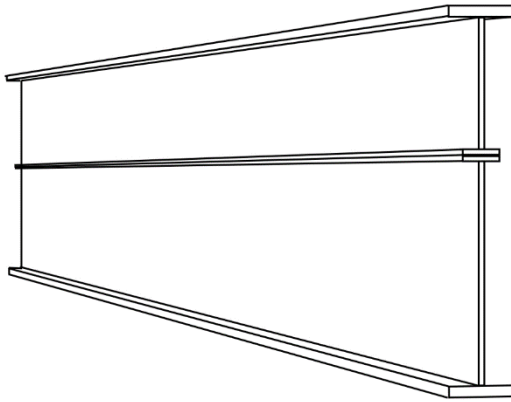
a – Longitudinal Web Splice Using Sub-Flanges (preferred)
